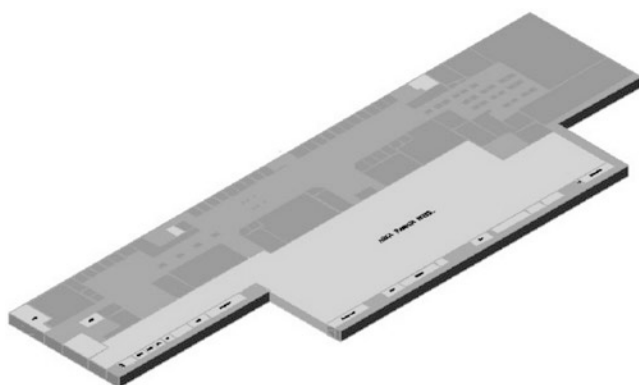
Solid 3D shape of Blok M mall building at B2 floor
